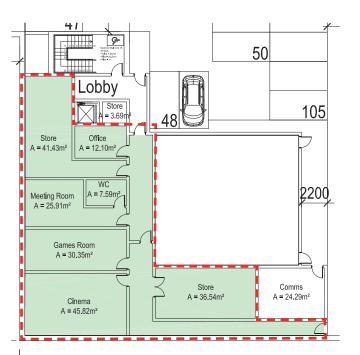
BASEMENT AMENITY: BLOCK 1
